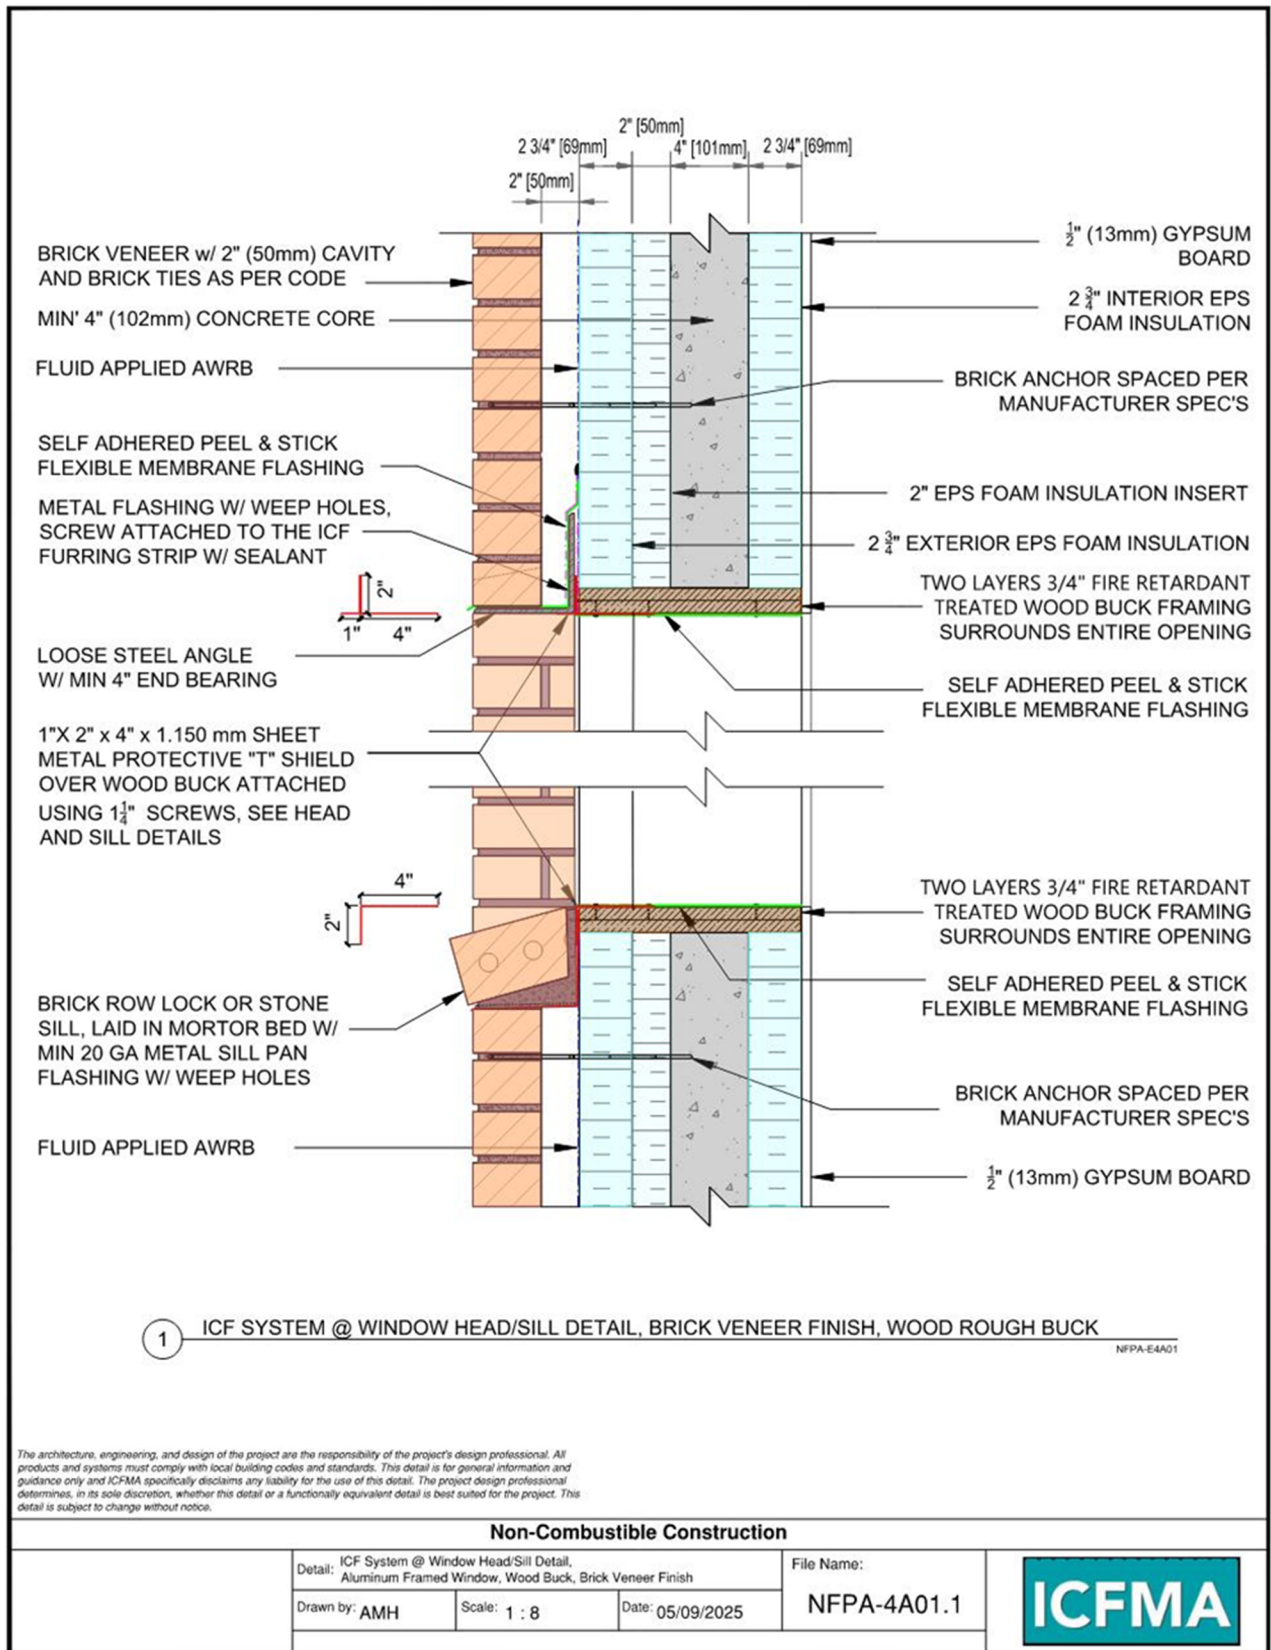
Exterior wall assembly incorporating brick veneer header and sill.
